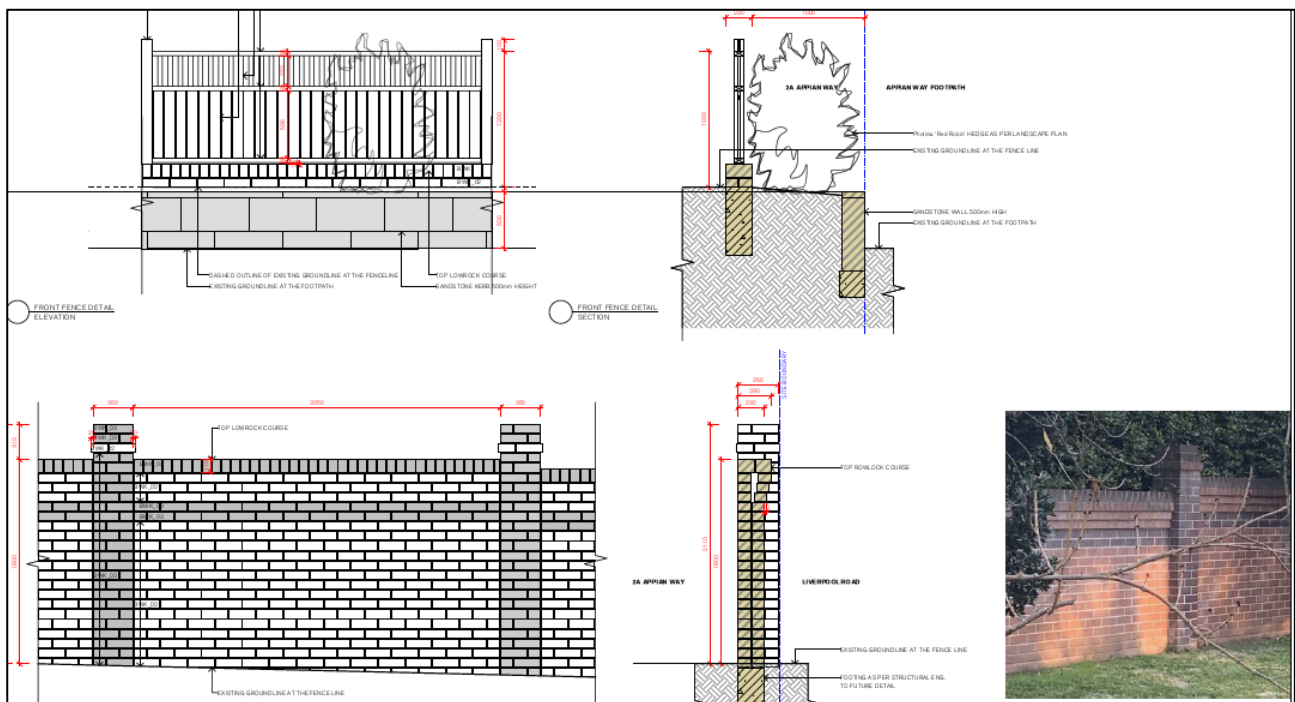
Extract of the applicant's submitted revised Front and Boundary Fence Plan.
